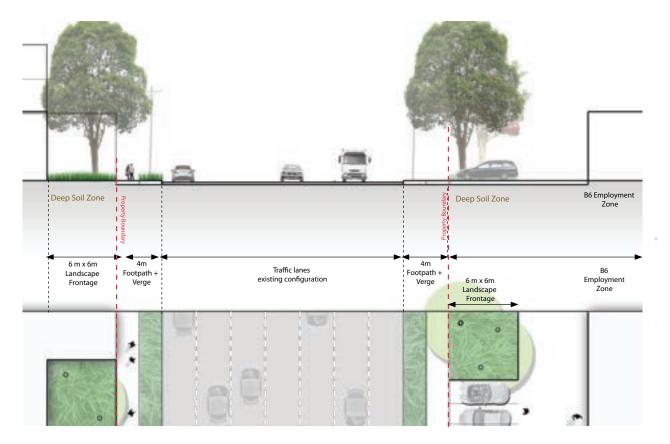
Indicative Section and Plan of Intermittent planting along the Princes Highway in the Banksia Precinct
